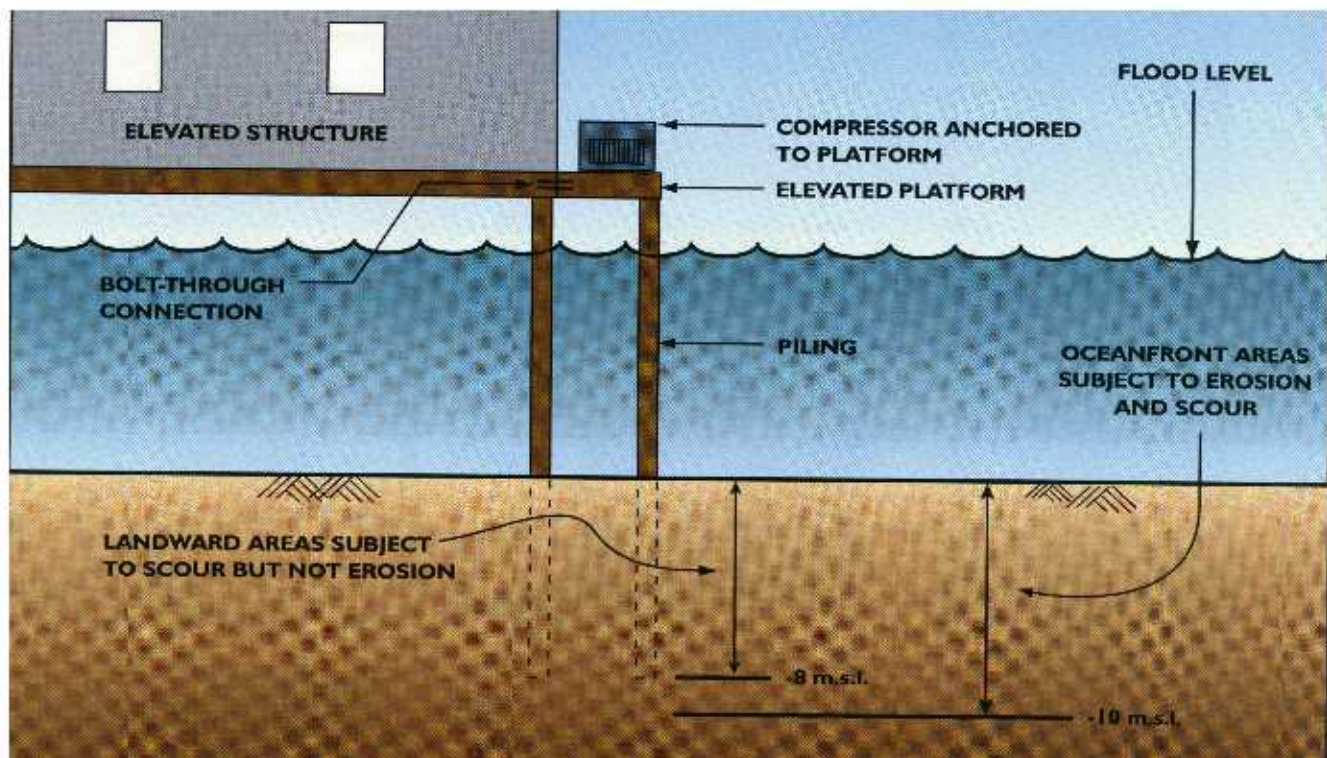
Air conditioner/heat pump compressor platform supported by pilings.
